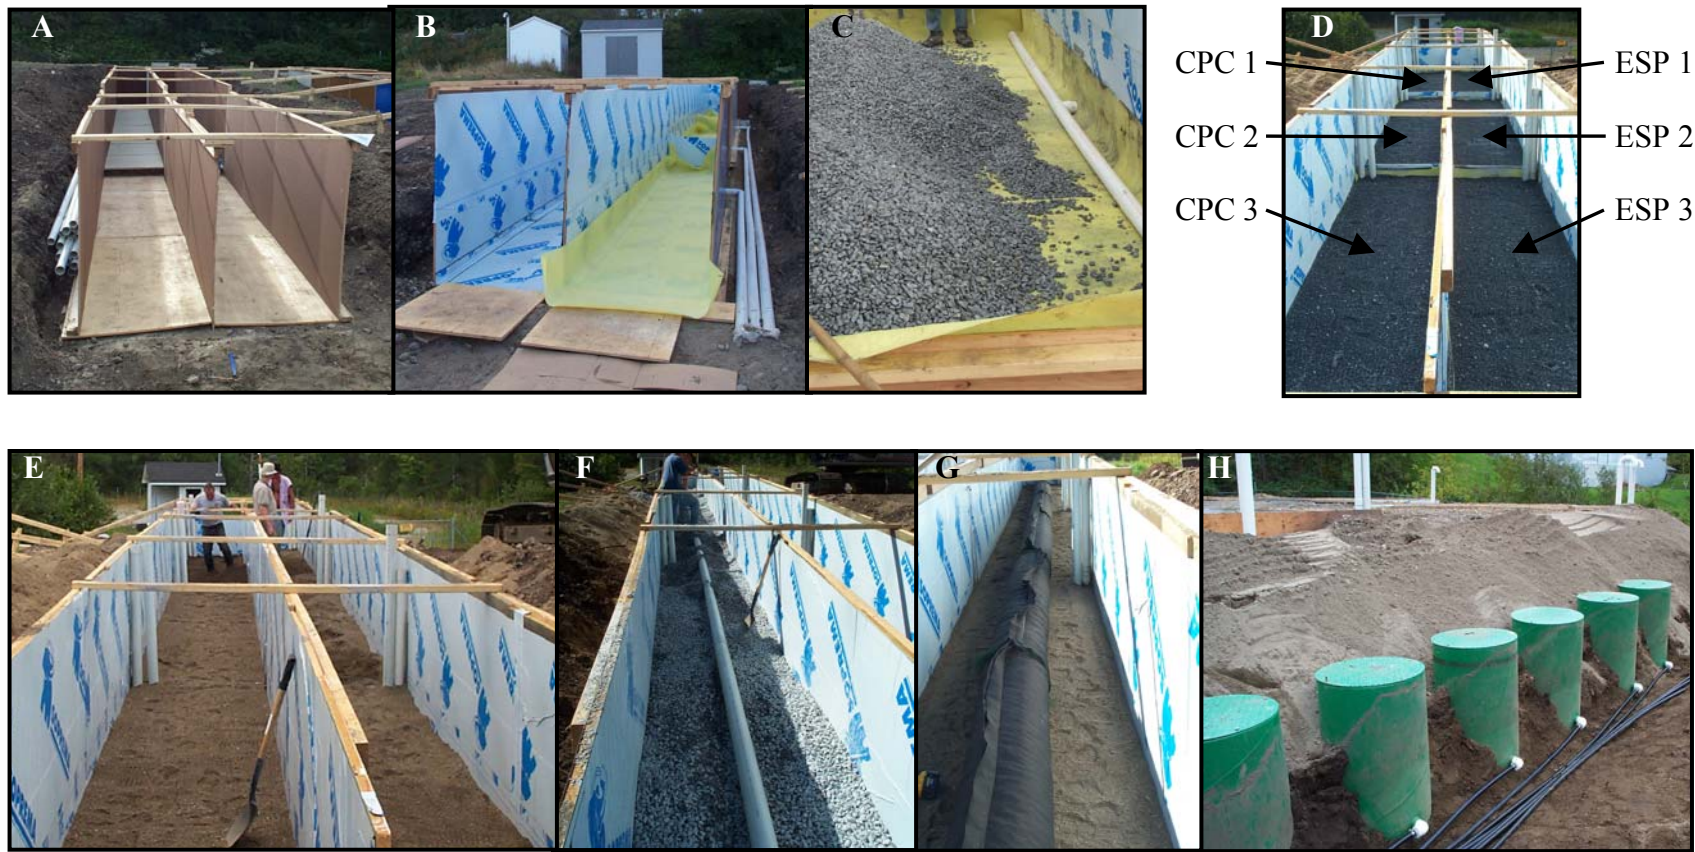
Installing model Enviro-Septic[®] and conventional pipe and stone leaching systems in Stoke, Quebec. A) Plywood-encased trenches, 60' long \times 3.5' wide, were divided lengthwise into three sections. Note the final 20' sections are 6" deeper than the first two 20' sections. B) A waterproof membrane and plastic canvas were applied to both trenches, and drain pipes attached to each section. C) Stone and 3" perforated PVC pipe allowed leachate to drain from the bottom of each trench section. D) The same amount of stone covered each section's bottom. The sections, deemed CPC 1, 2 and 3, and ESP 1, 2 and 3, can be seen here. E) A layer of clean medium-coarse sand covered the stone. The two trenches are identical at this point. F) For the conventional model system, a 60' length of standard 4" perforated PVC pipe was installed in crushed stone. G) In the other trench, sixty feet of Enviro-Septic[®] pipe were installed within a layer of sand. H) Leachate from each trench section drained to a separate drainage receptacle (green cylinders), where its volume was continually measured, and samples were taken for comparative analysis. Leachate in the drainage receptacles was then pumped (via black hoses) to the Stoke municipal sewage treatment area located just downhill from the test site.
